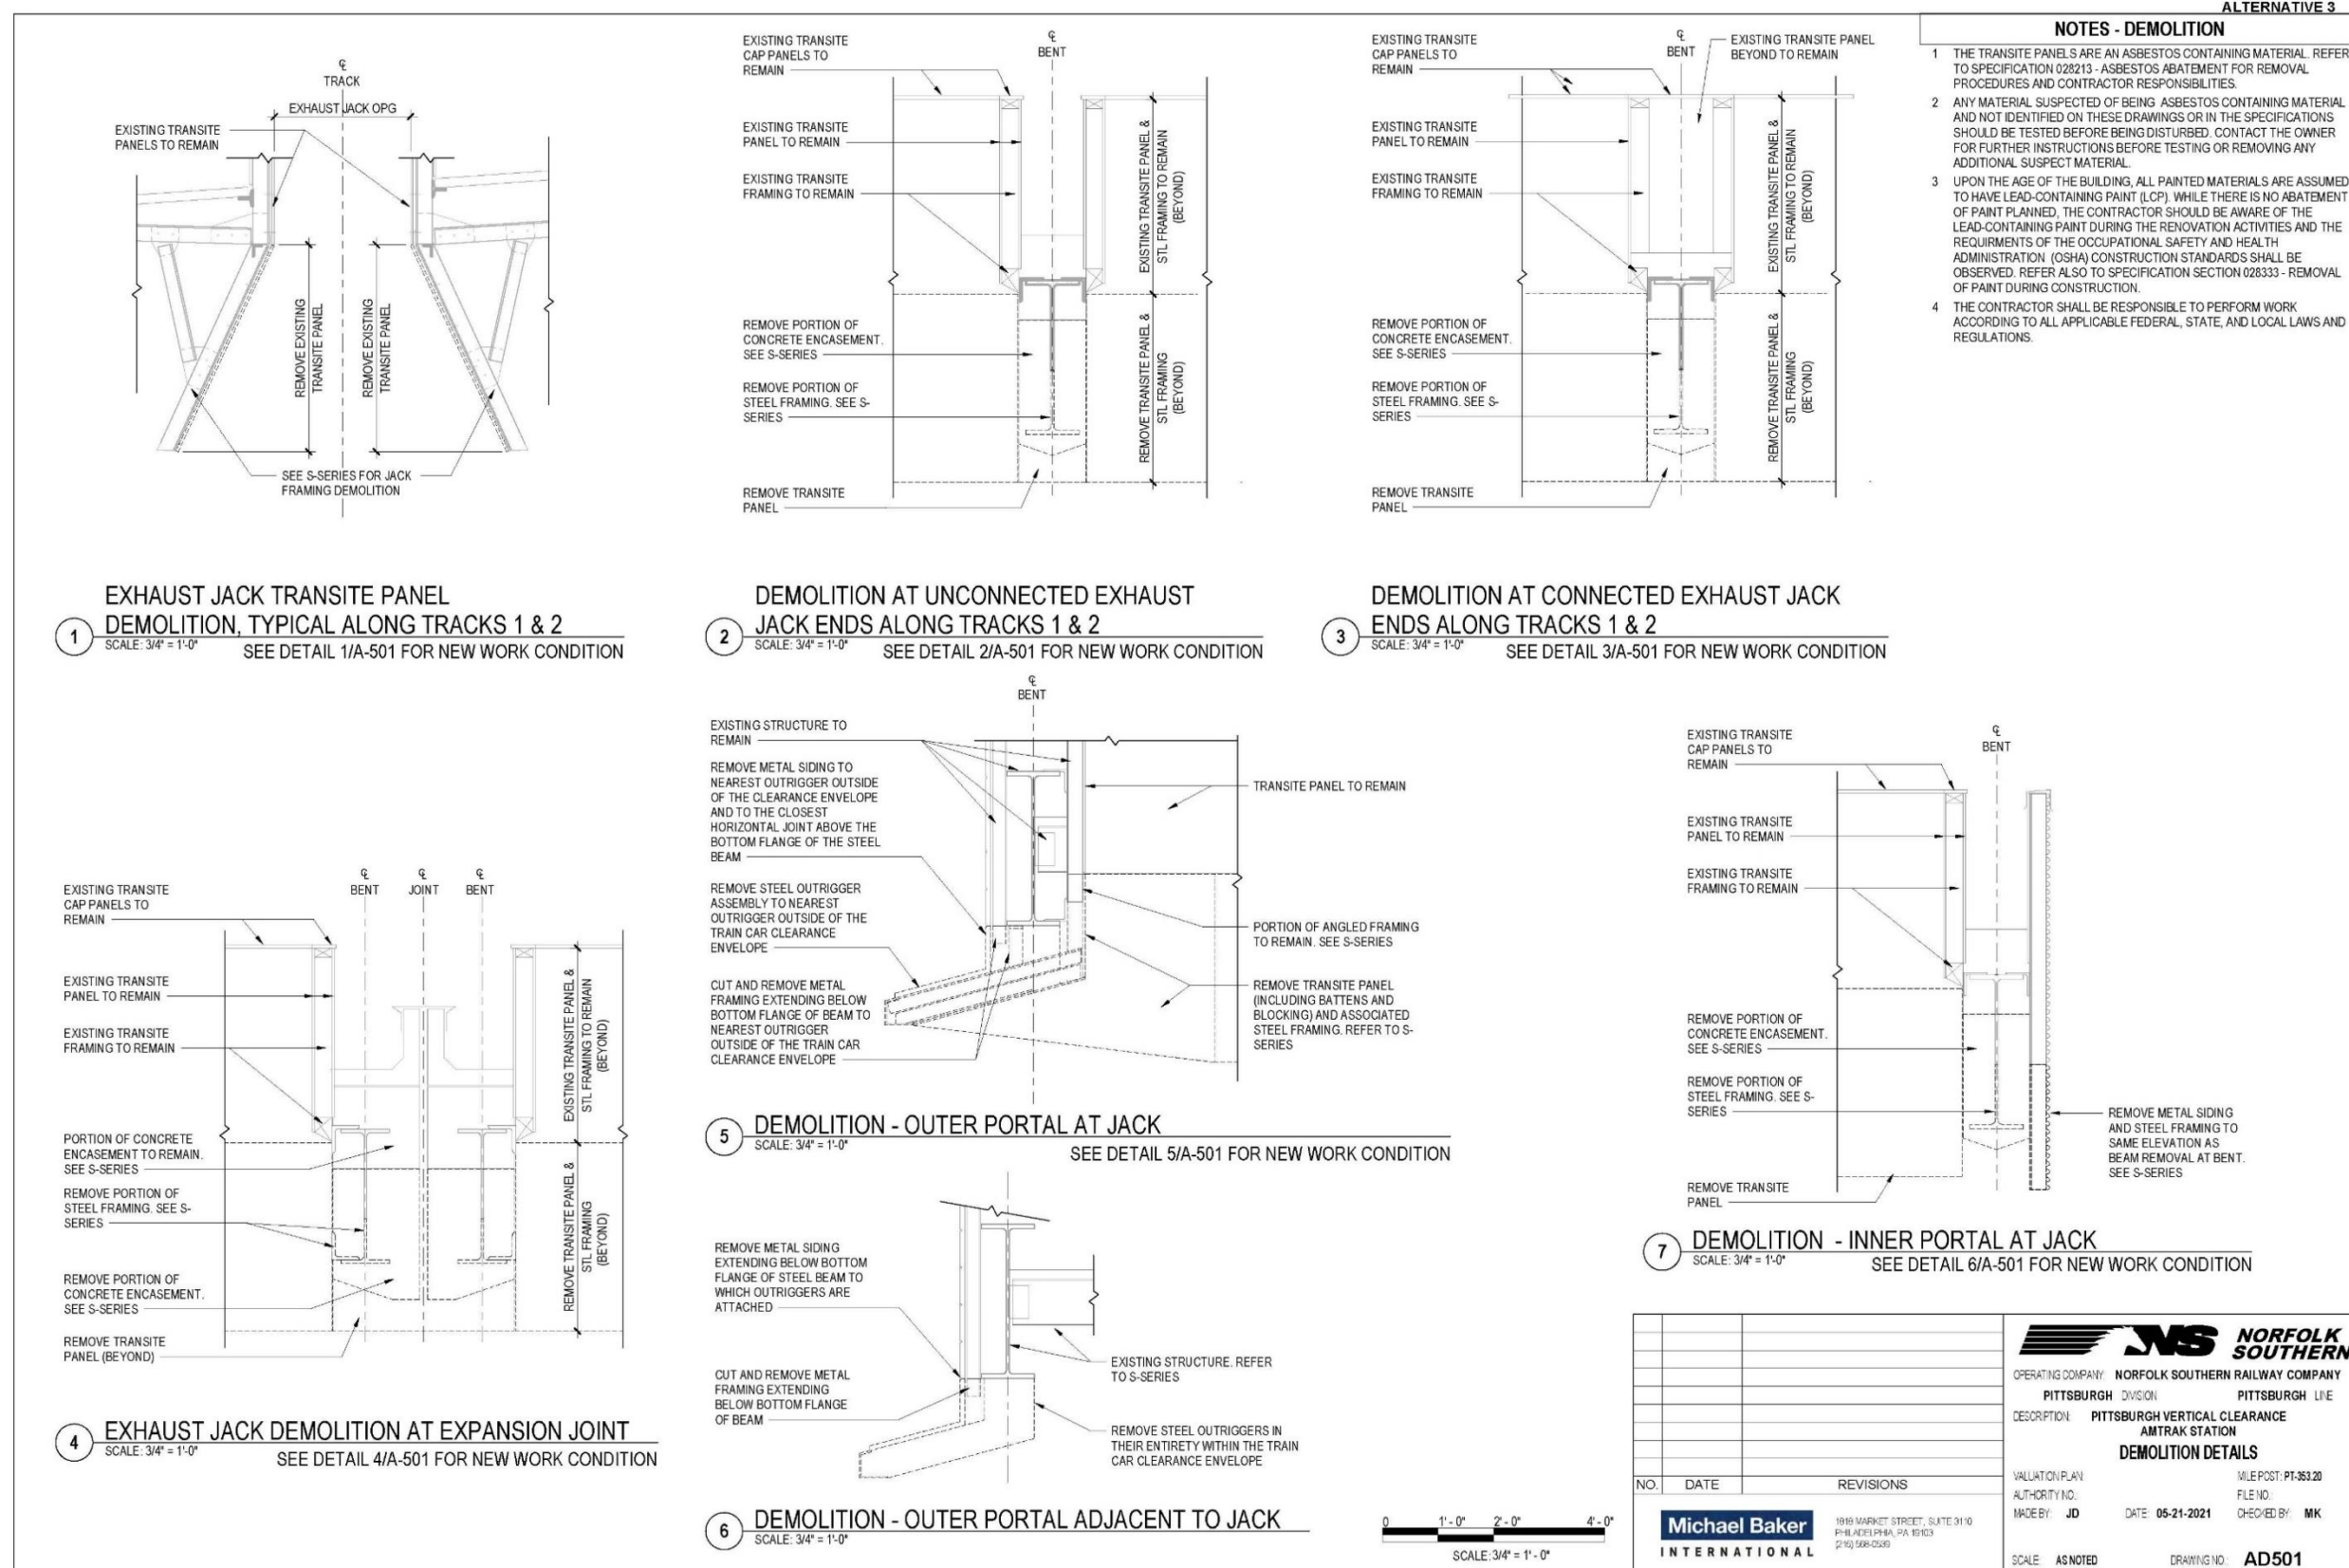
Plan sheet showing modifications to exhaust jack.
